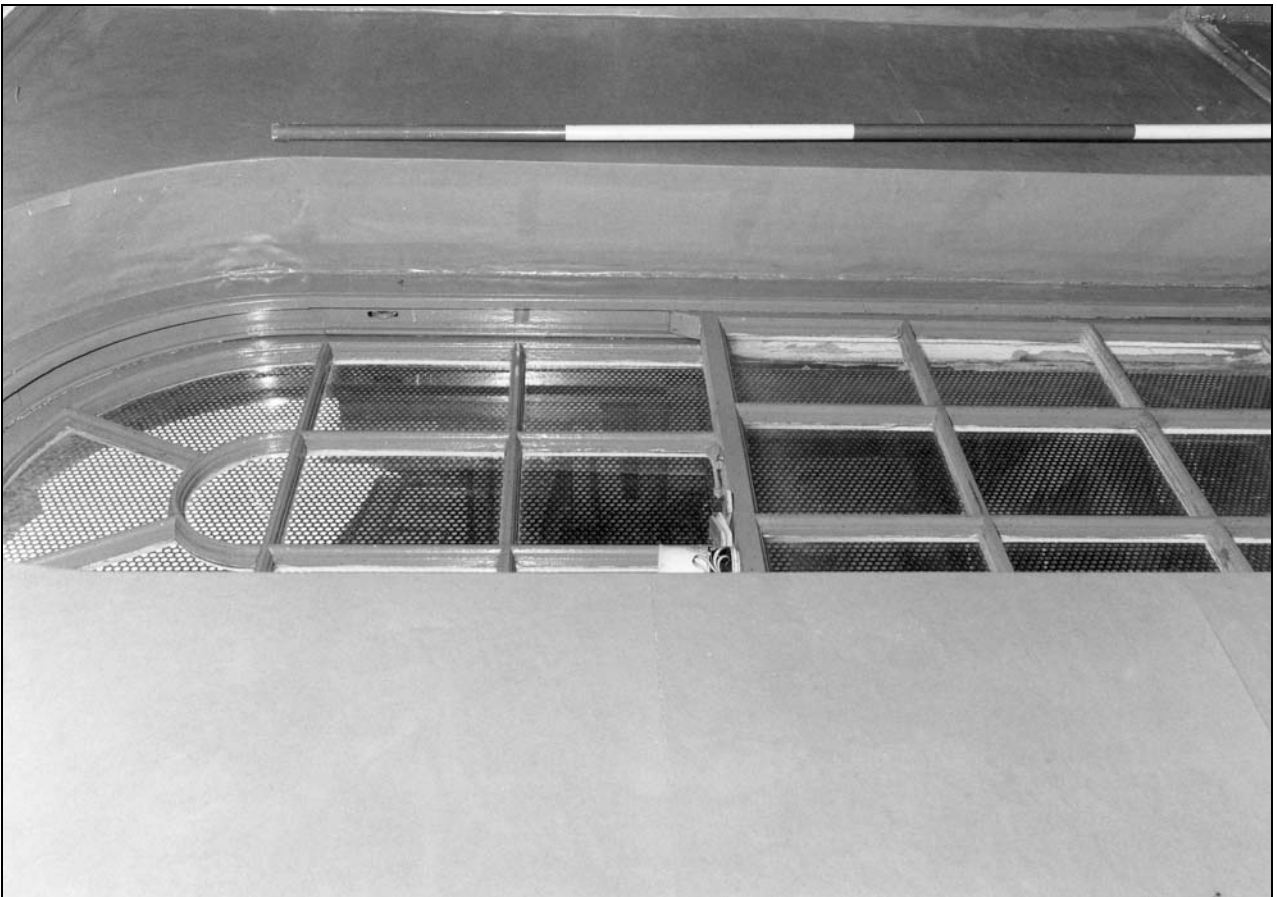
South wing: new central front window to first floor (WF02) (film 4, frame 3)
